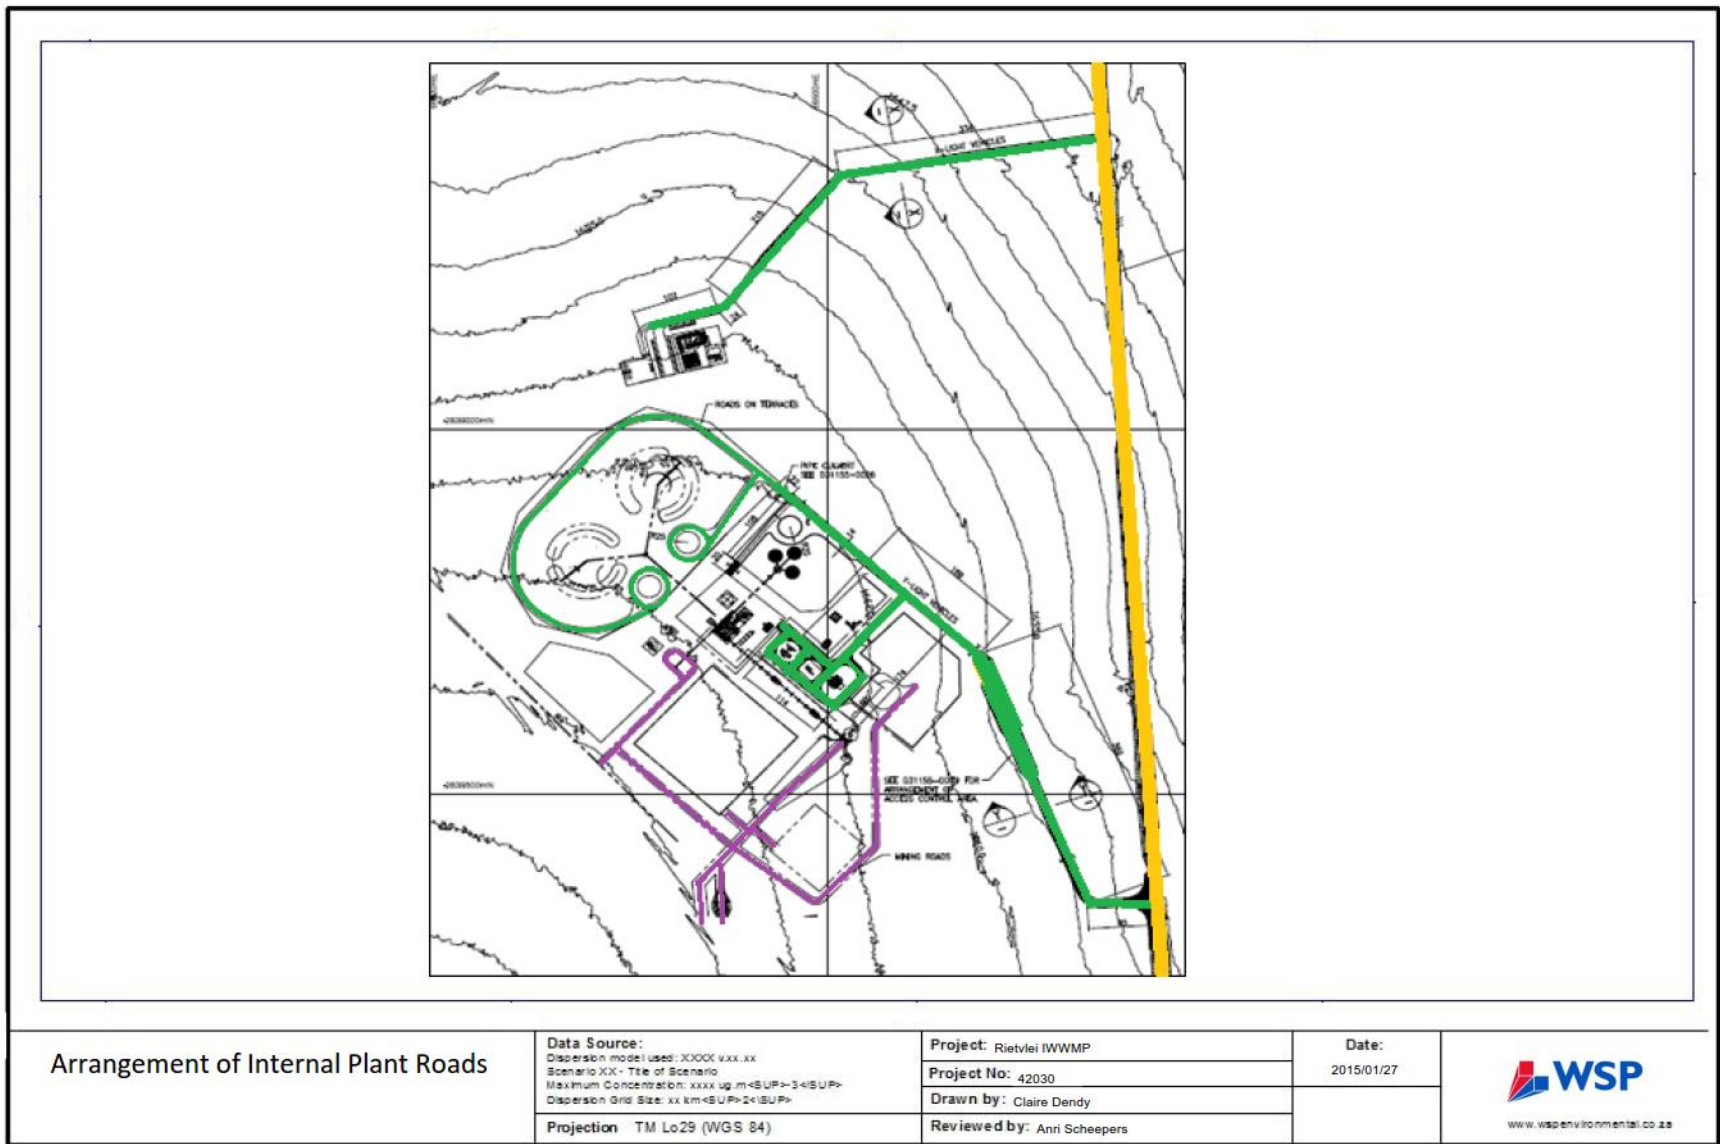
Arrangement of Internal Plant Roads (Mindset, 2013)
